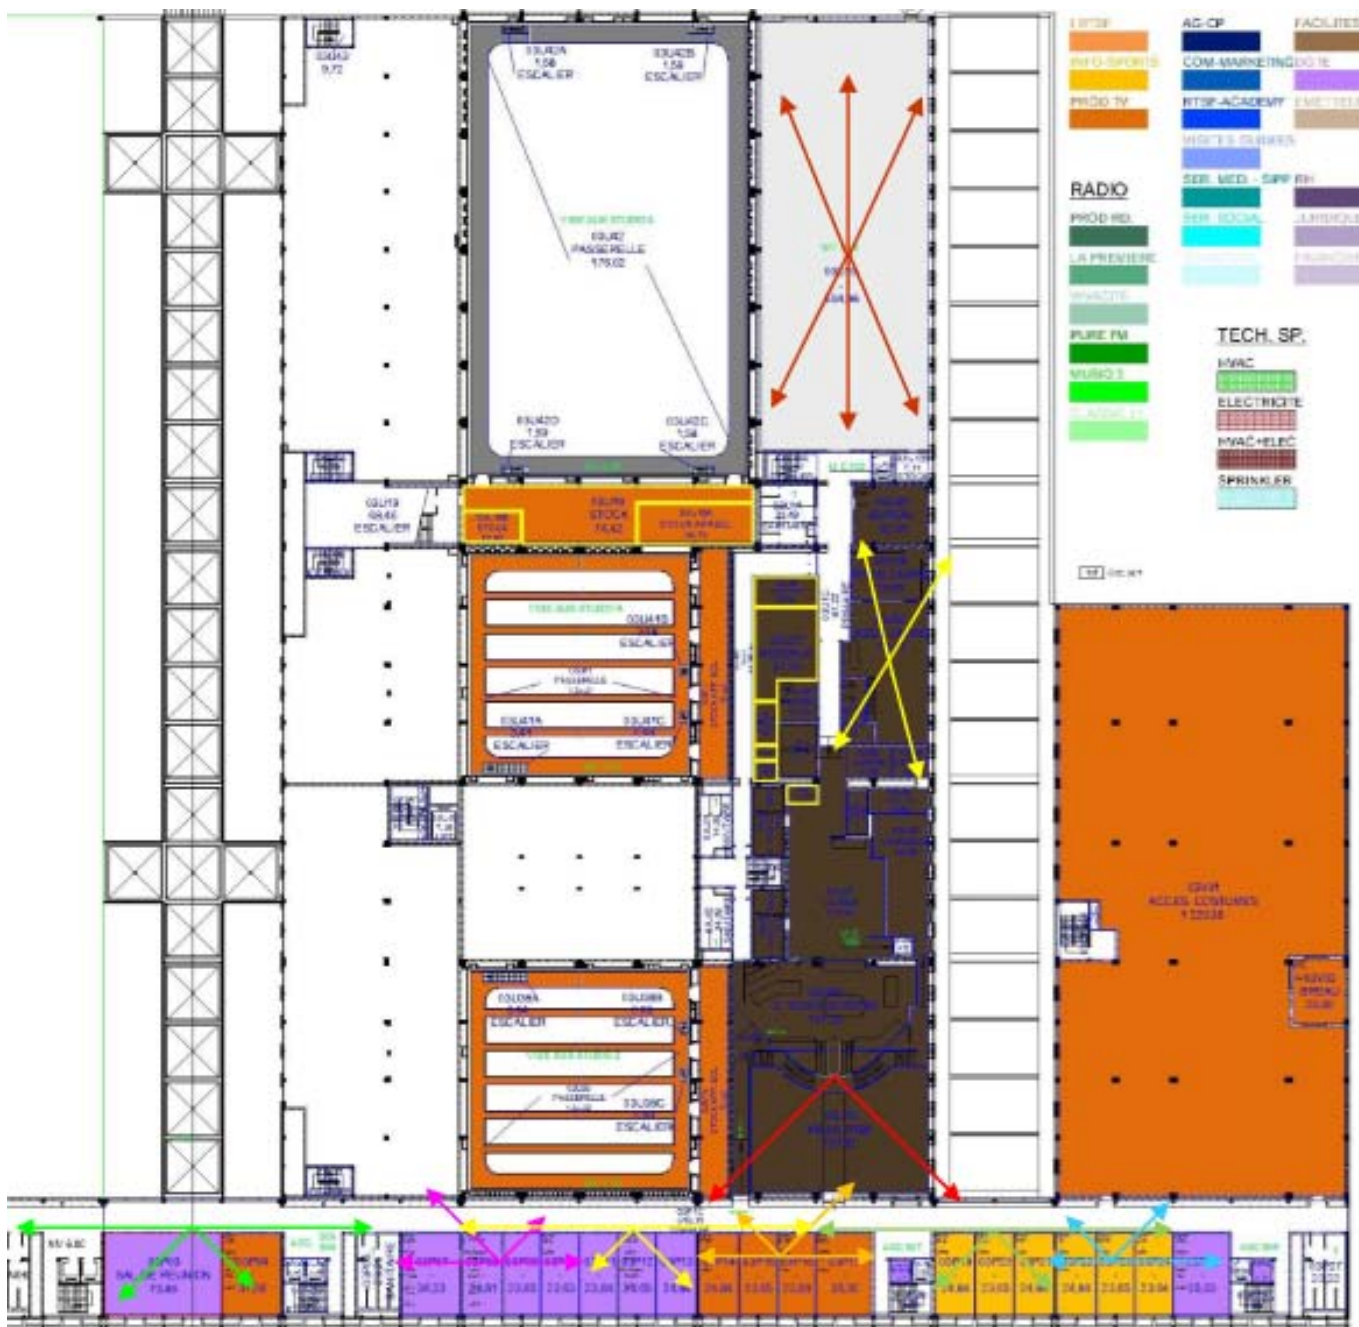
Design at 5 GHz for Floor 3 in Building CHJM
